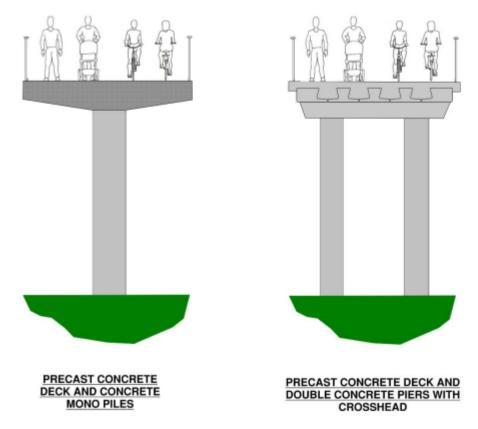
Elevated ramp structure option 2: precast prestressed concrete
